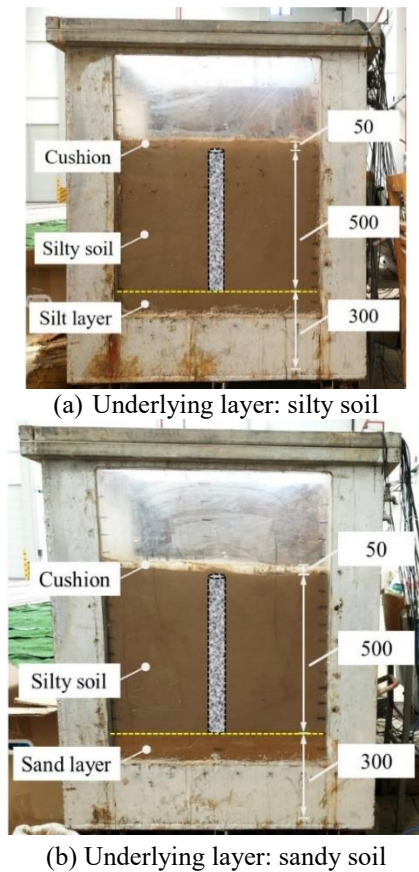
Pervious concrete piles with different underlying layers (unit: mm)
